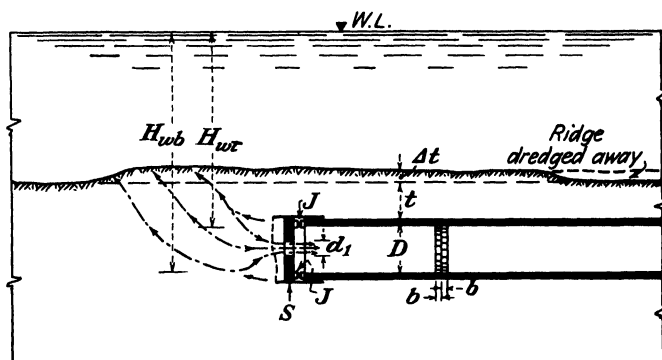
Longitudinal section of subaqueous tunnel, showing principle of shield method of construction through mud or soft clay.
